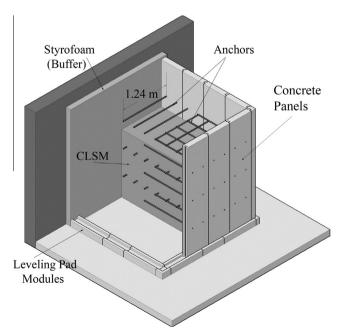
Design of a CLSM bridge abutment and location of embedded steel rebars.
